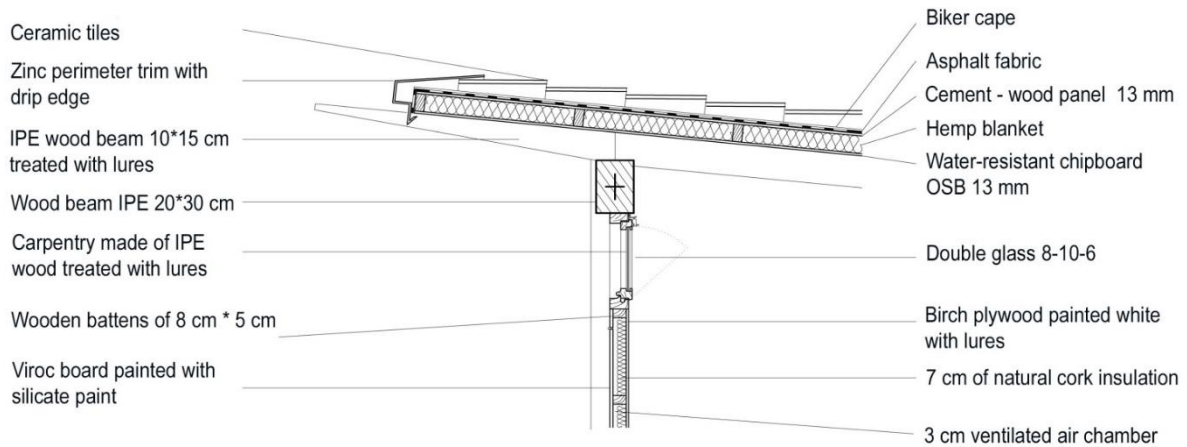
Construction detail of the sloping roof of *Mariposa* house.
